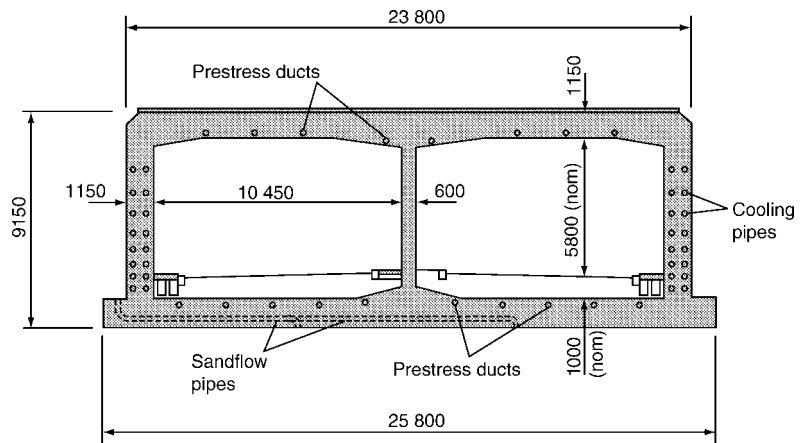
Cross-section of immersed tunnel (dimensions in mm)
